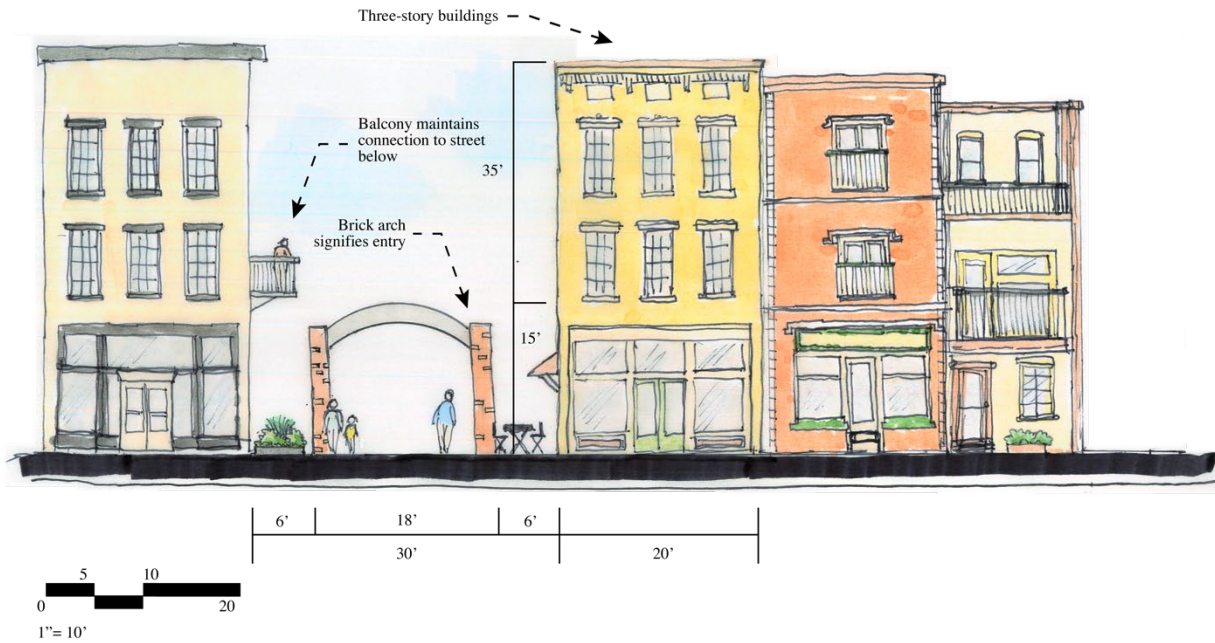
Section view of Centre Avenue and Grove Street Shopping Alley looking north on Grove Street. Graphic by author.
